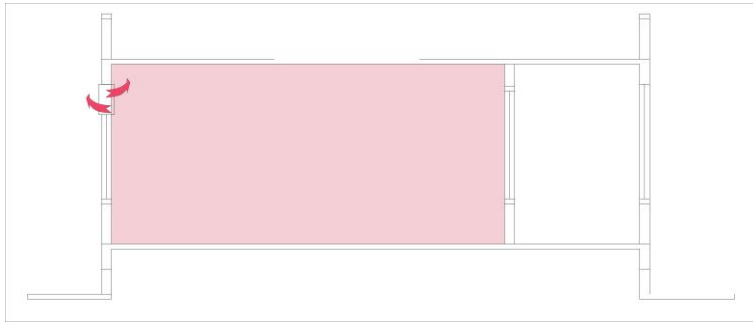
Classroom cross-section - electric fans located on or by windows can improve air exchange in classrooms
